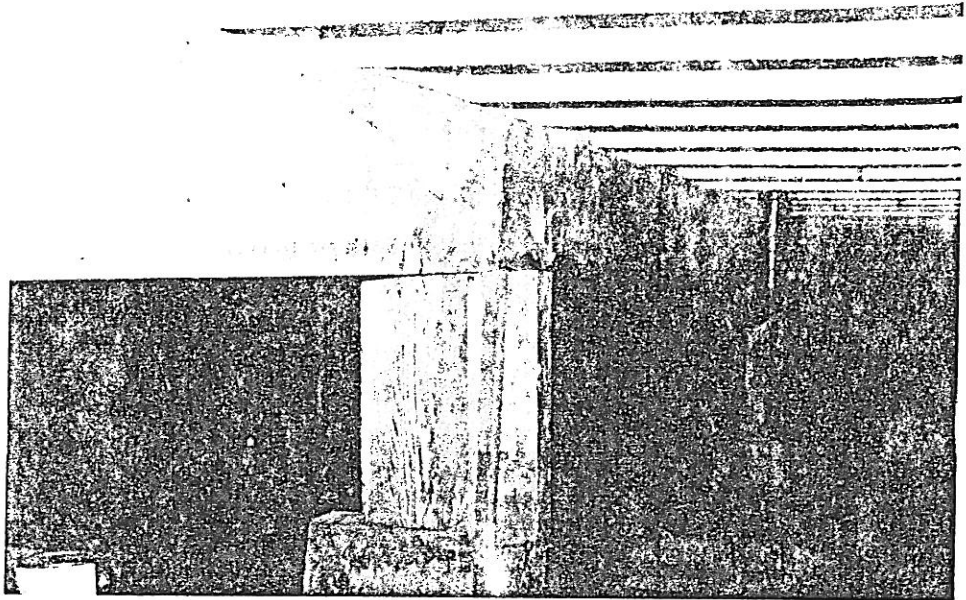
VERTICAL MISALIGNMENT OF MAIN BEAM AT BUTT JOINT
